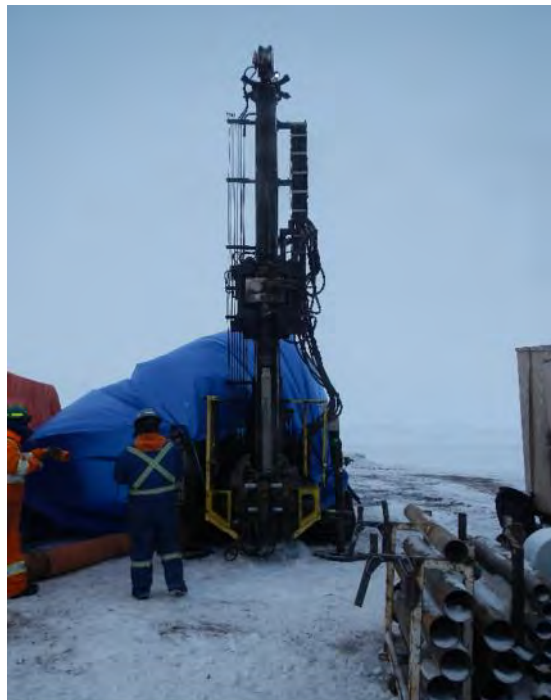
Drilling Conditions at BH18-M002, April 2018
